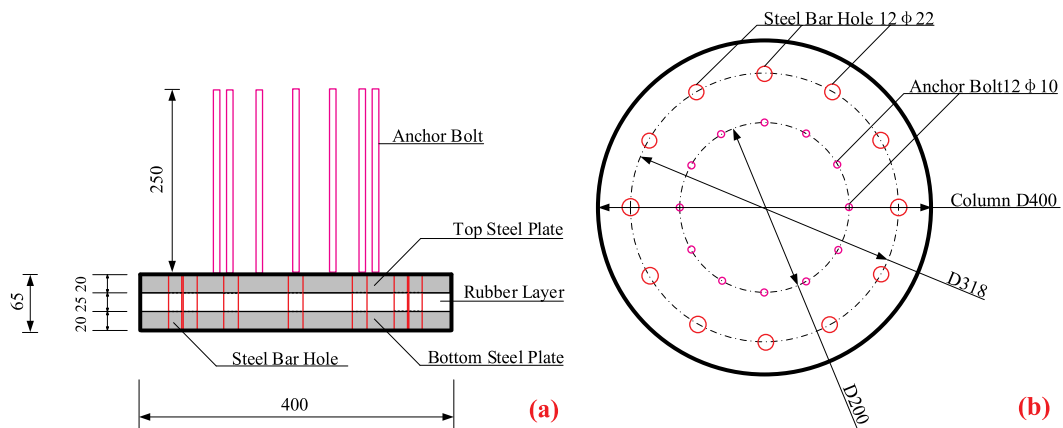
Single rubber pad in GCP-S (unit: mm): (a) elevation view, (b) plan view.
